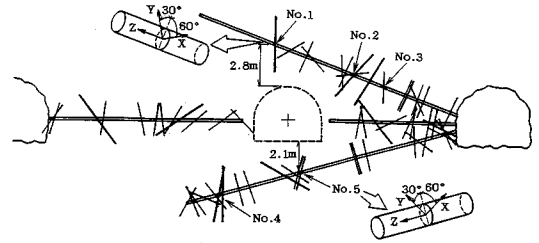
Schematic drawing of testing section in jointed rock mass. Joint deformers are set up at No.1-5 positions.
